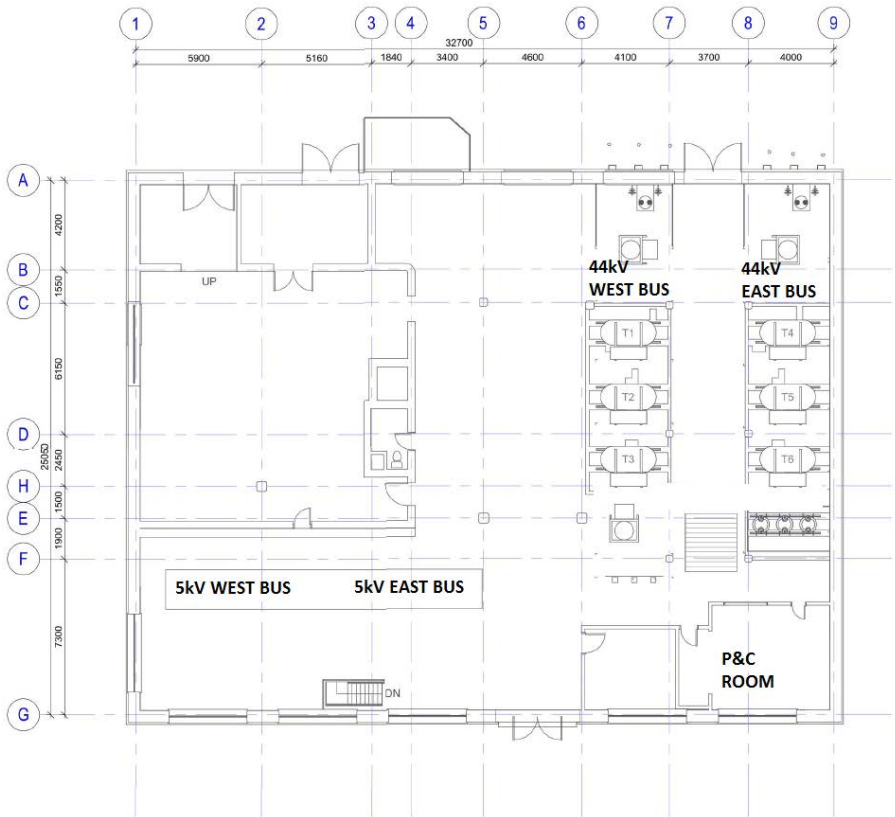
Substation No.1 - Existing Floor Plan Layout
